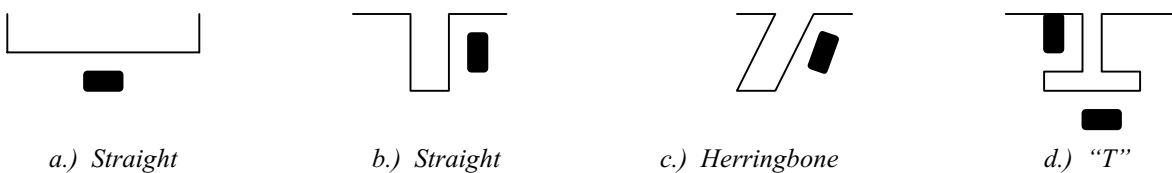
Straight, Herringbone, and “T” Pier Layouts
